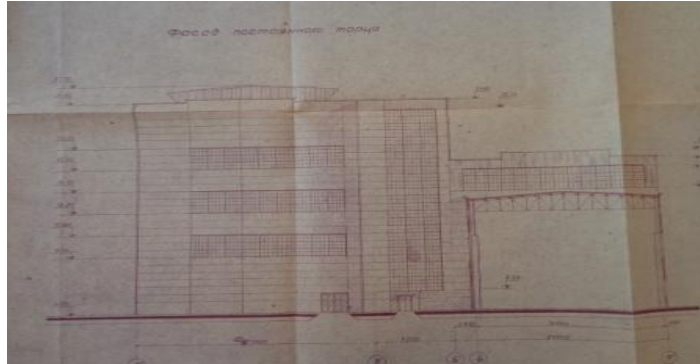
Elevation and cross section between blocks 1-2 y and 3-4
